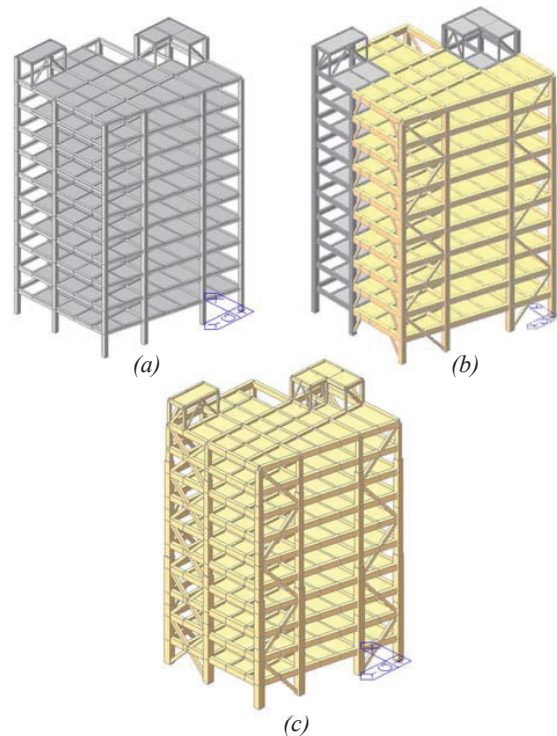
(a) Steel structure; (b) steel-timber structure; (c) timber structure.
